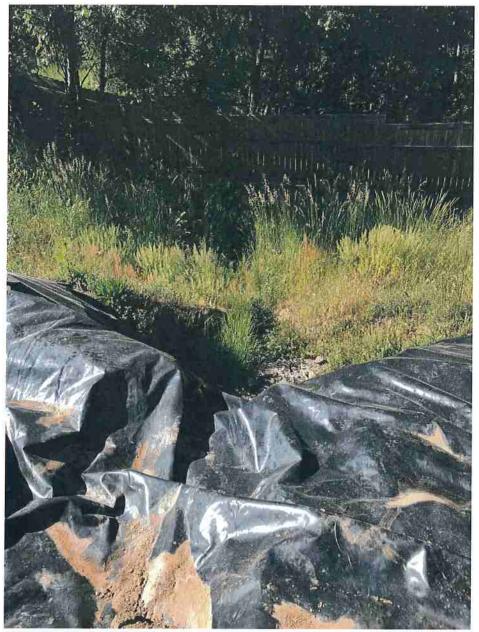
Looking south at spillway to Class III channel from retaining pond (Observation Point 1(b)) at Conversion Area #1.
